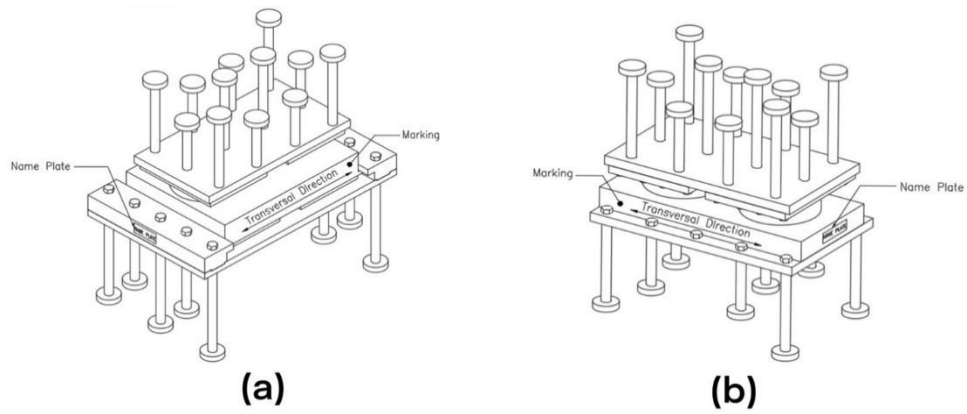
(a) Fixed-bearing and (b) Free-bearing
